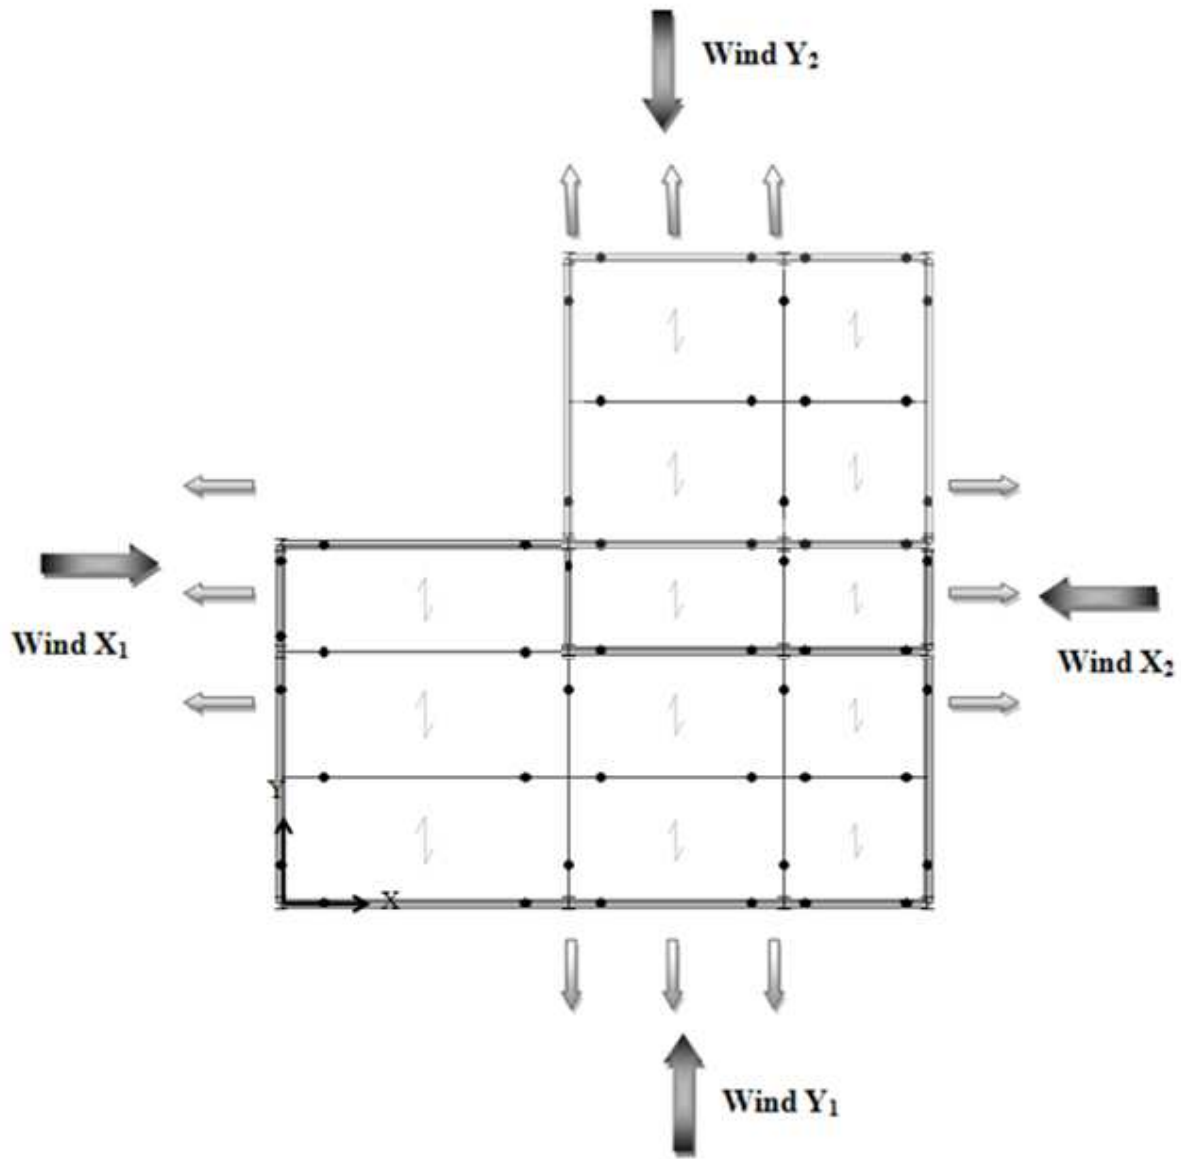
Simple frames with pinned connections and direction of winds (top view plan) for asymmetrical plan and section.
